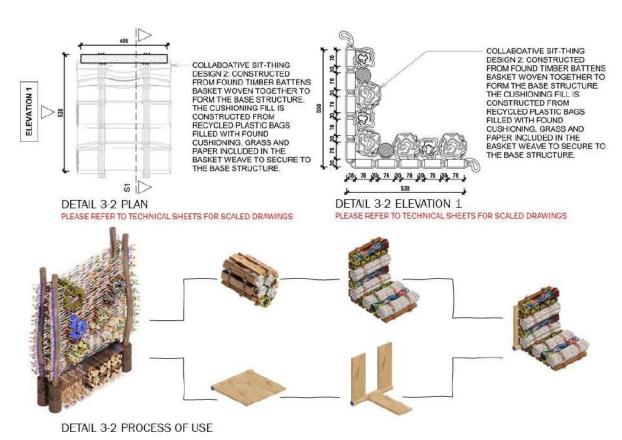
Technical drawings of detail 3.2 as specified (Author, 2021).
